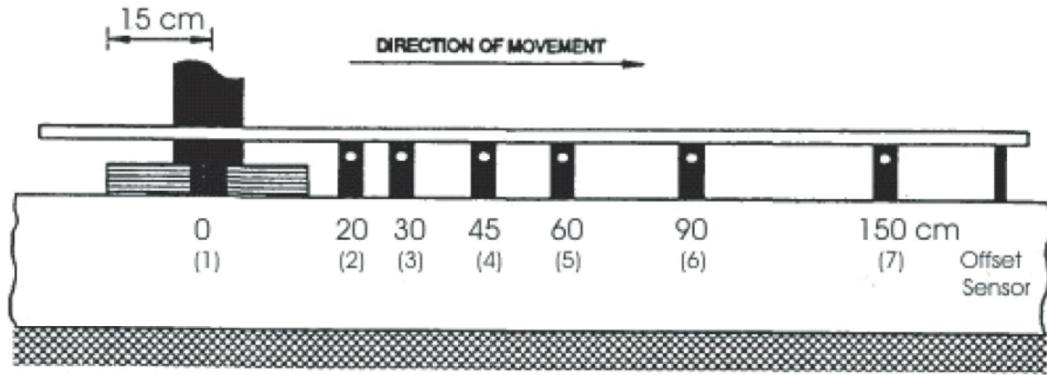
Typical FWD Sensor Spacing for Flexible Pavement Deflection Test [Chan & Lane, 2005]
